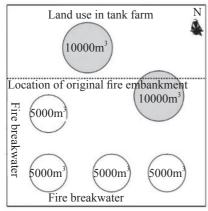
Flammable Liquid Storage Tank Group Arrangement Plan B
